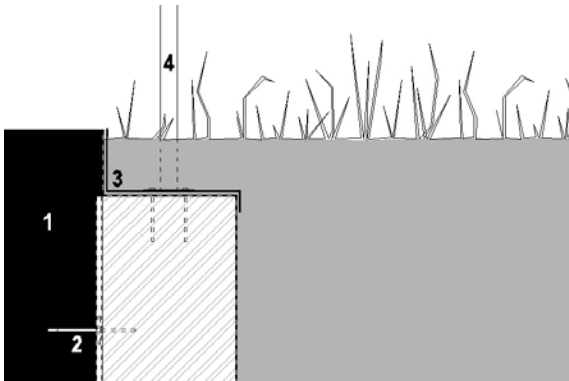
Sliding anchors. Vertical section. (1) poured earth; (2) sliding anchor; (3) metal flashing on top of bitumen; (4) handrail
